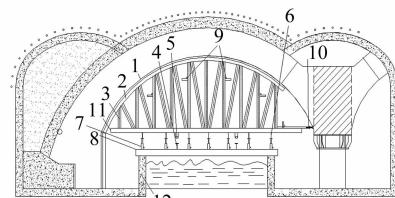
Construction process profile diagram of second lining arch of metro underground excavation station
